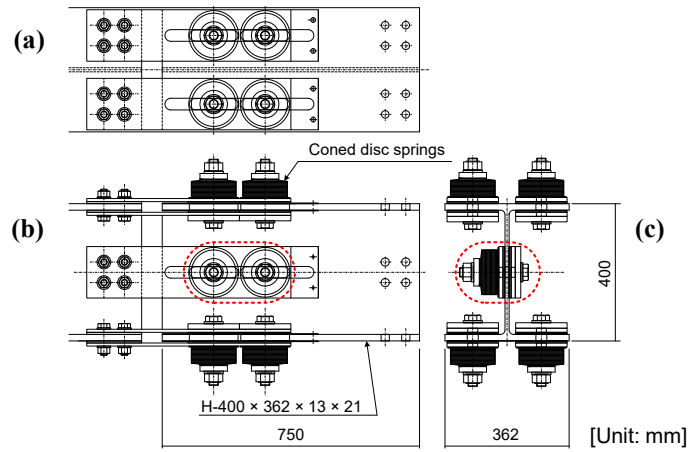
Drawings of the brace-type multi-unit friction damper used in full-scale tests: (a) plan view; (b) elevation view; and (c) sectional view¹⁾
